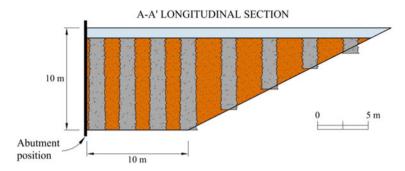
Longitudinal cross section of the jet-grouting treatment applied at both embankments
